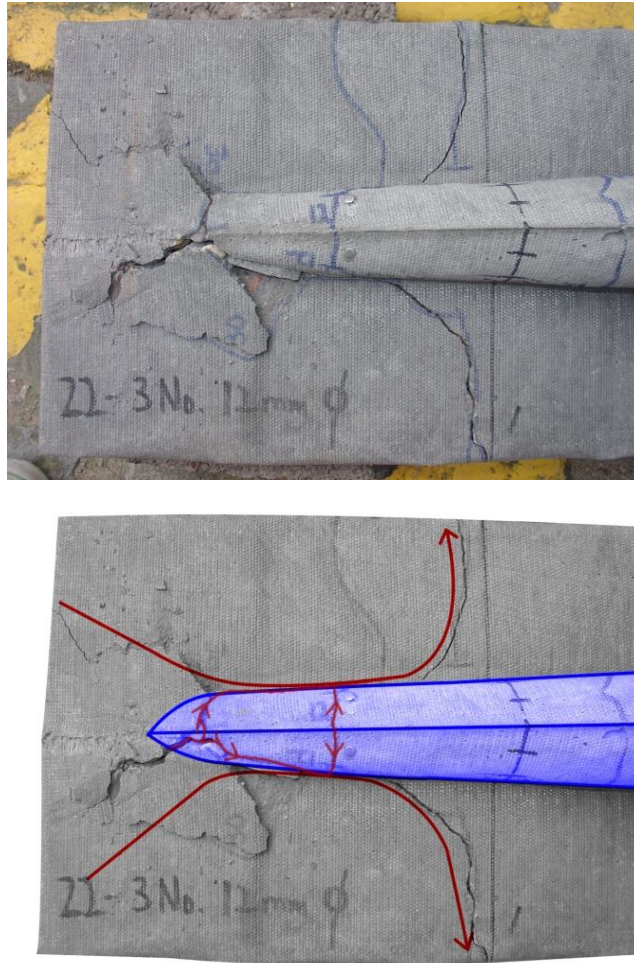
Showing the crack pattern near the end of web of 22SADF-3no-12mm
